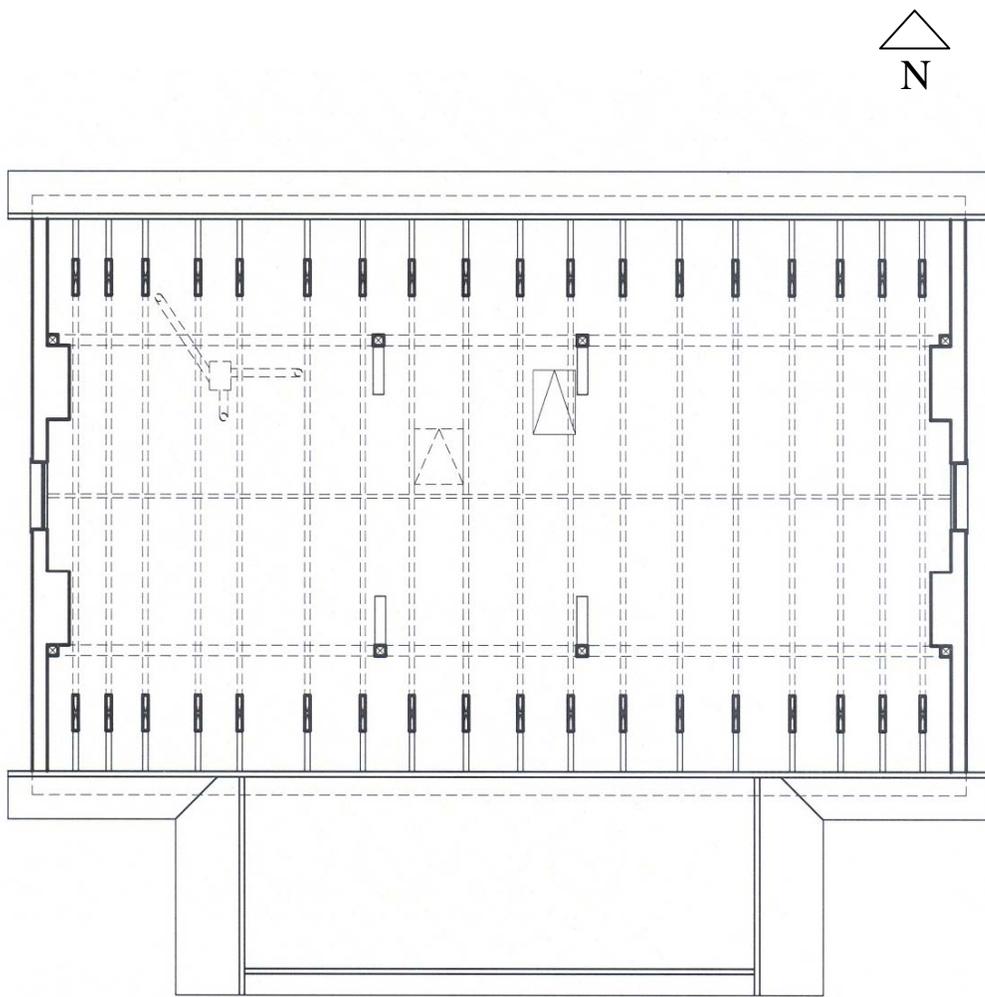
Attic plan of the Hunt House, December 2006. Not to scale.
